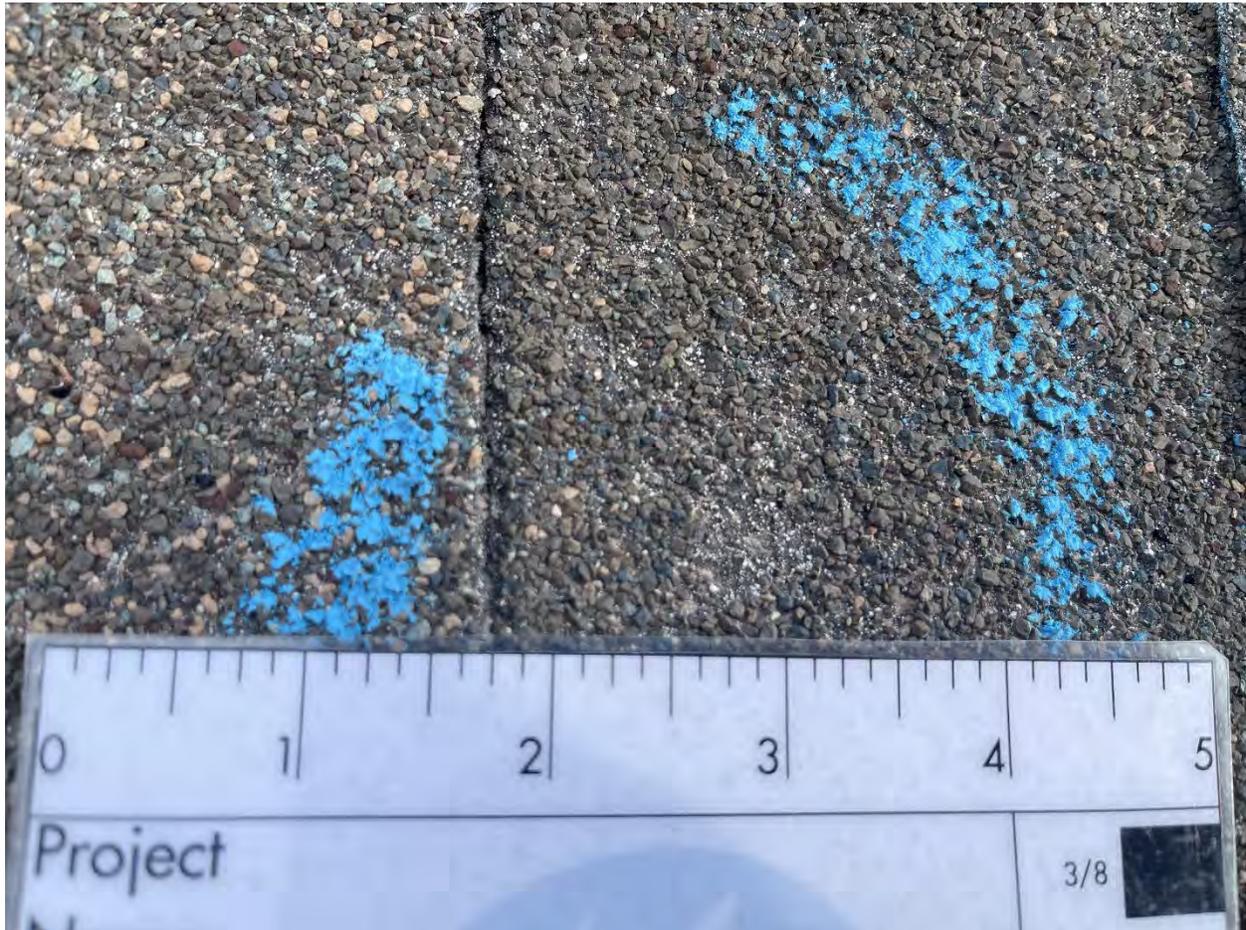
Example of west facing slope on Building 26 constructed in 2006.
